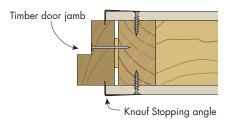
Timber Door jamb With Stopping Angle - Plan
